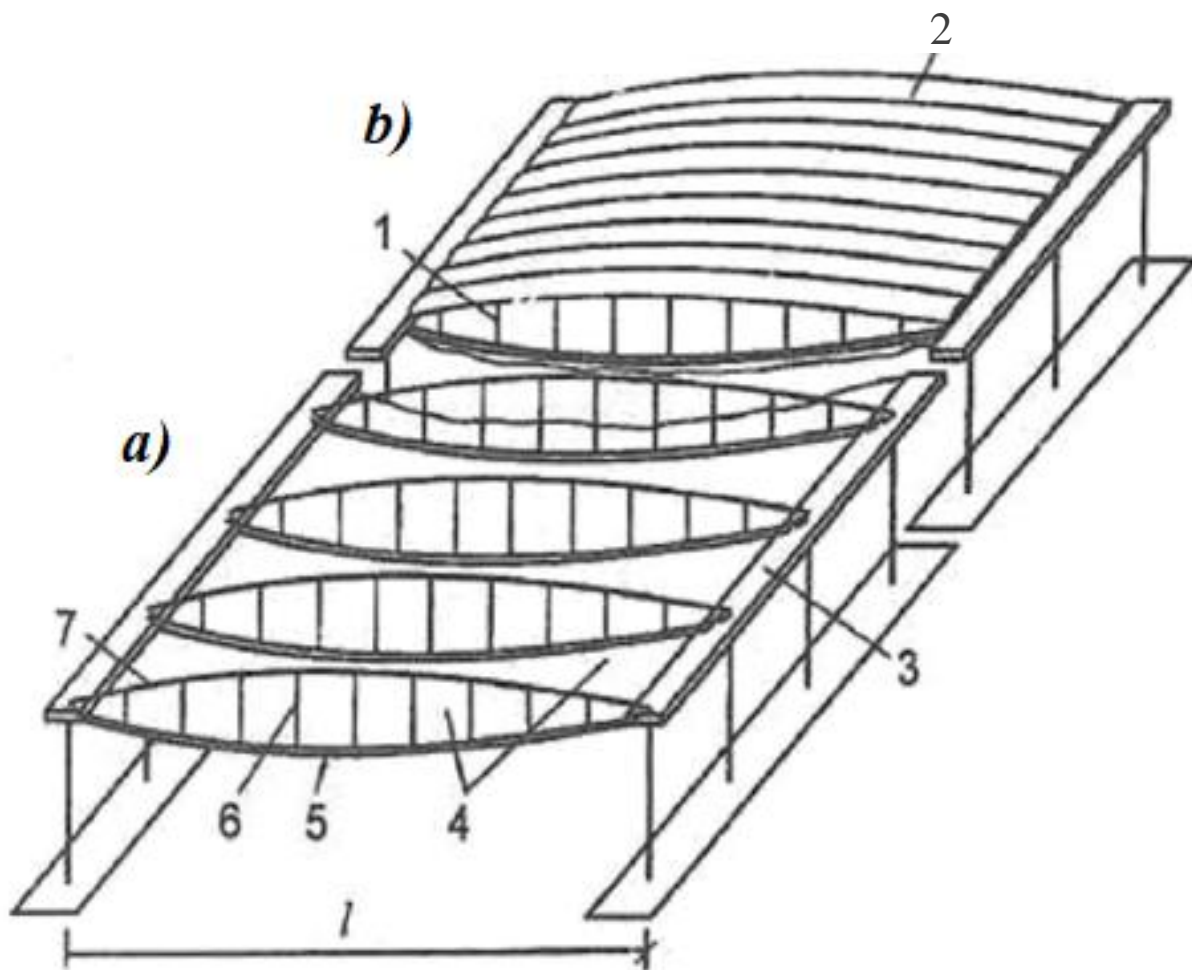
Double-tier cylindrical shells on a rectangular plan:
